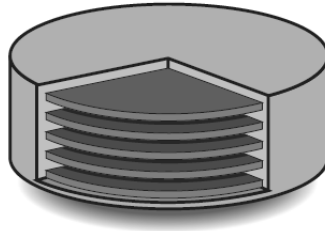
Elastomeric bearing (<http://www.freyrom.ro/produse-aparate-razem-elastomer.php>)
